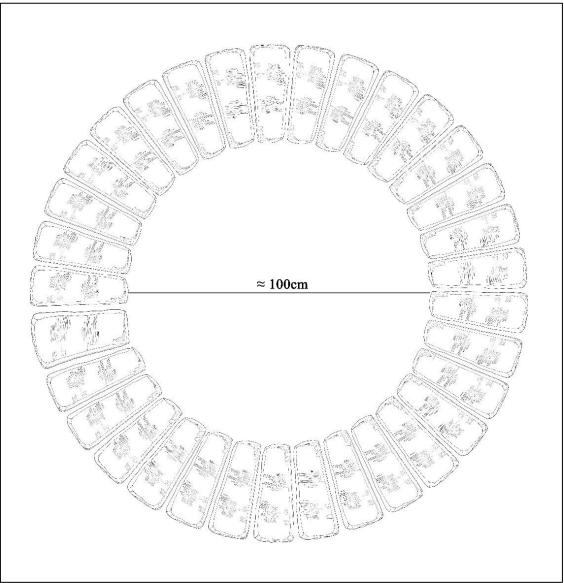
A reconstruction of furnace plan structure of type A bricks excavated from Tieniucun (source: author)
